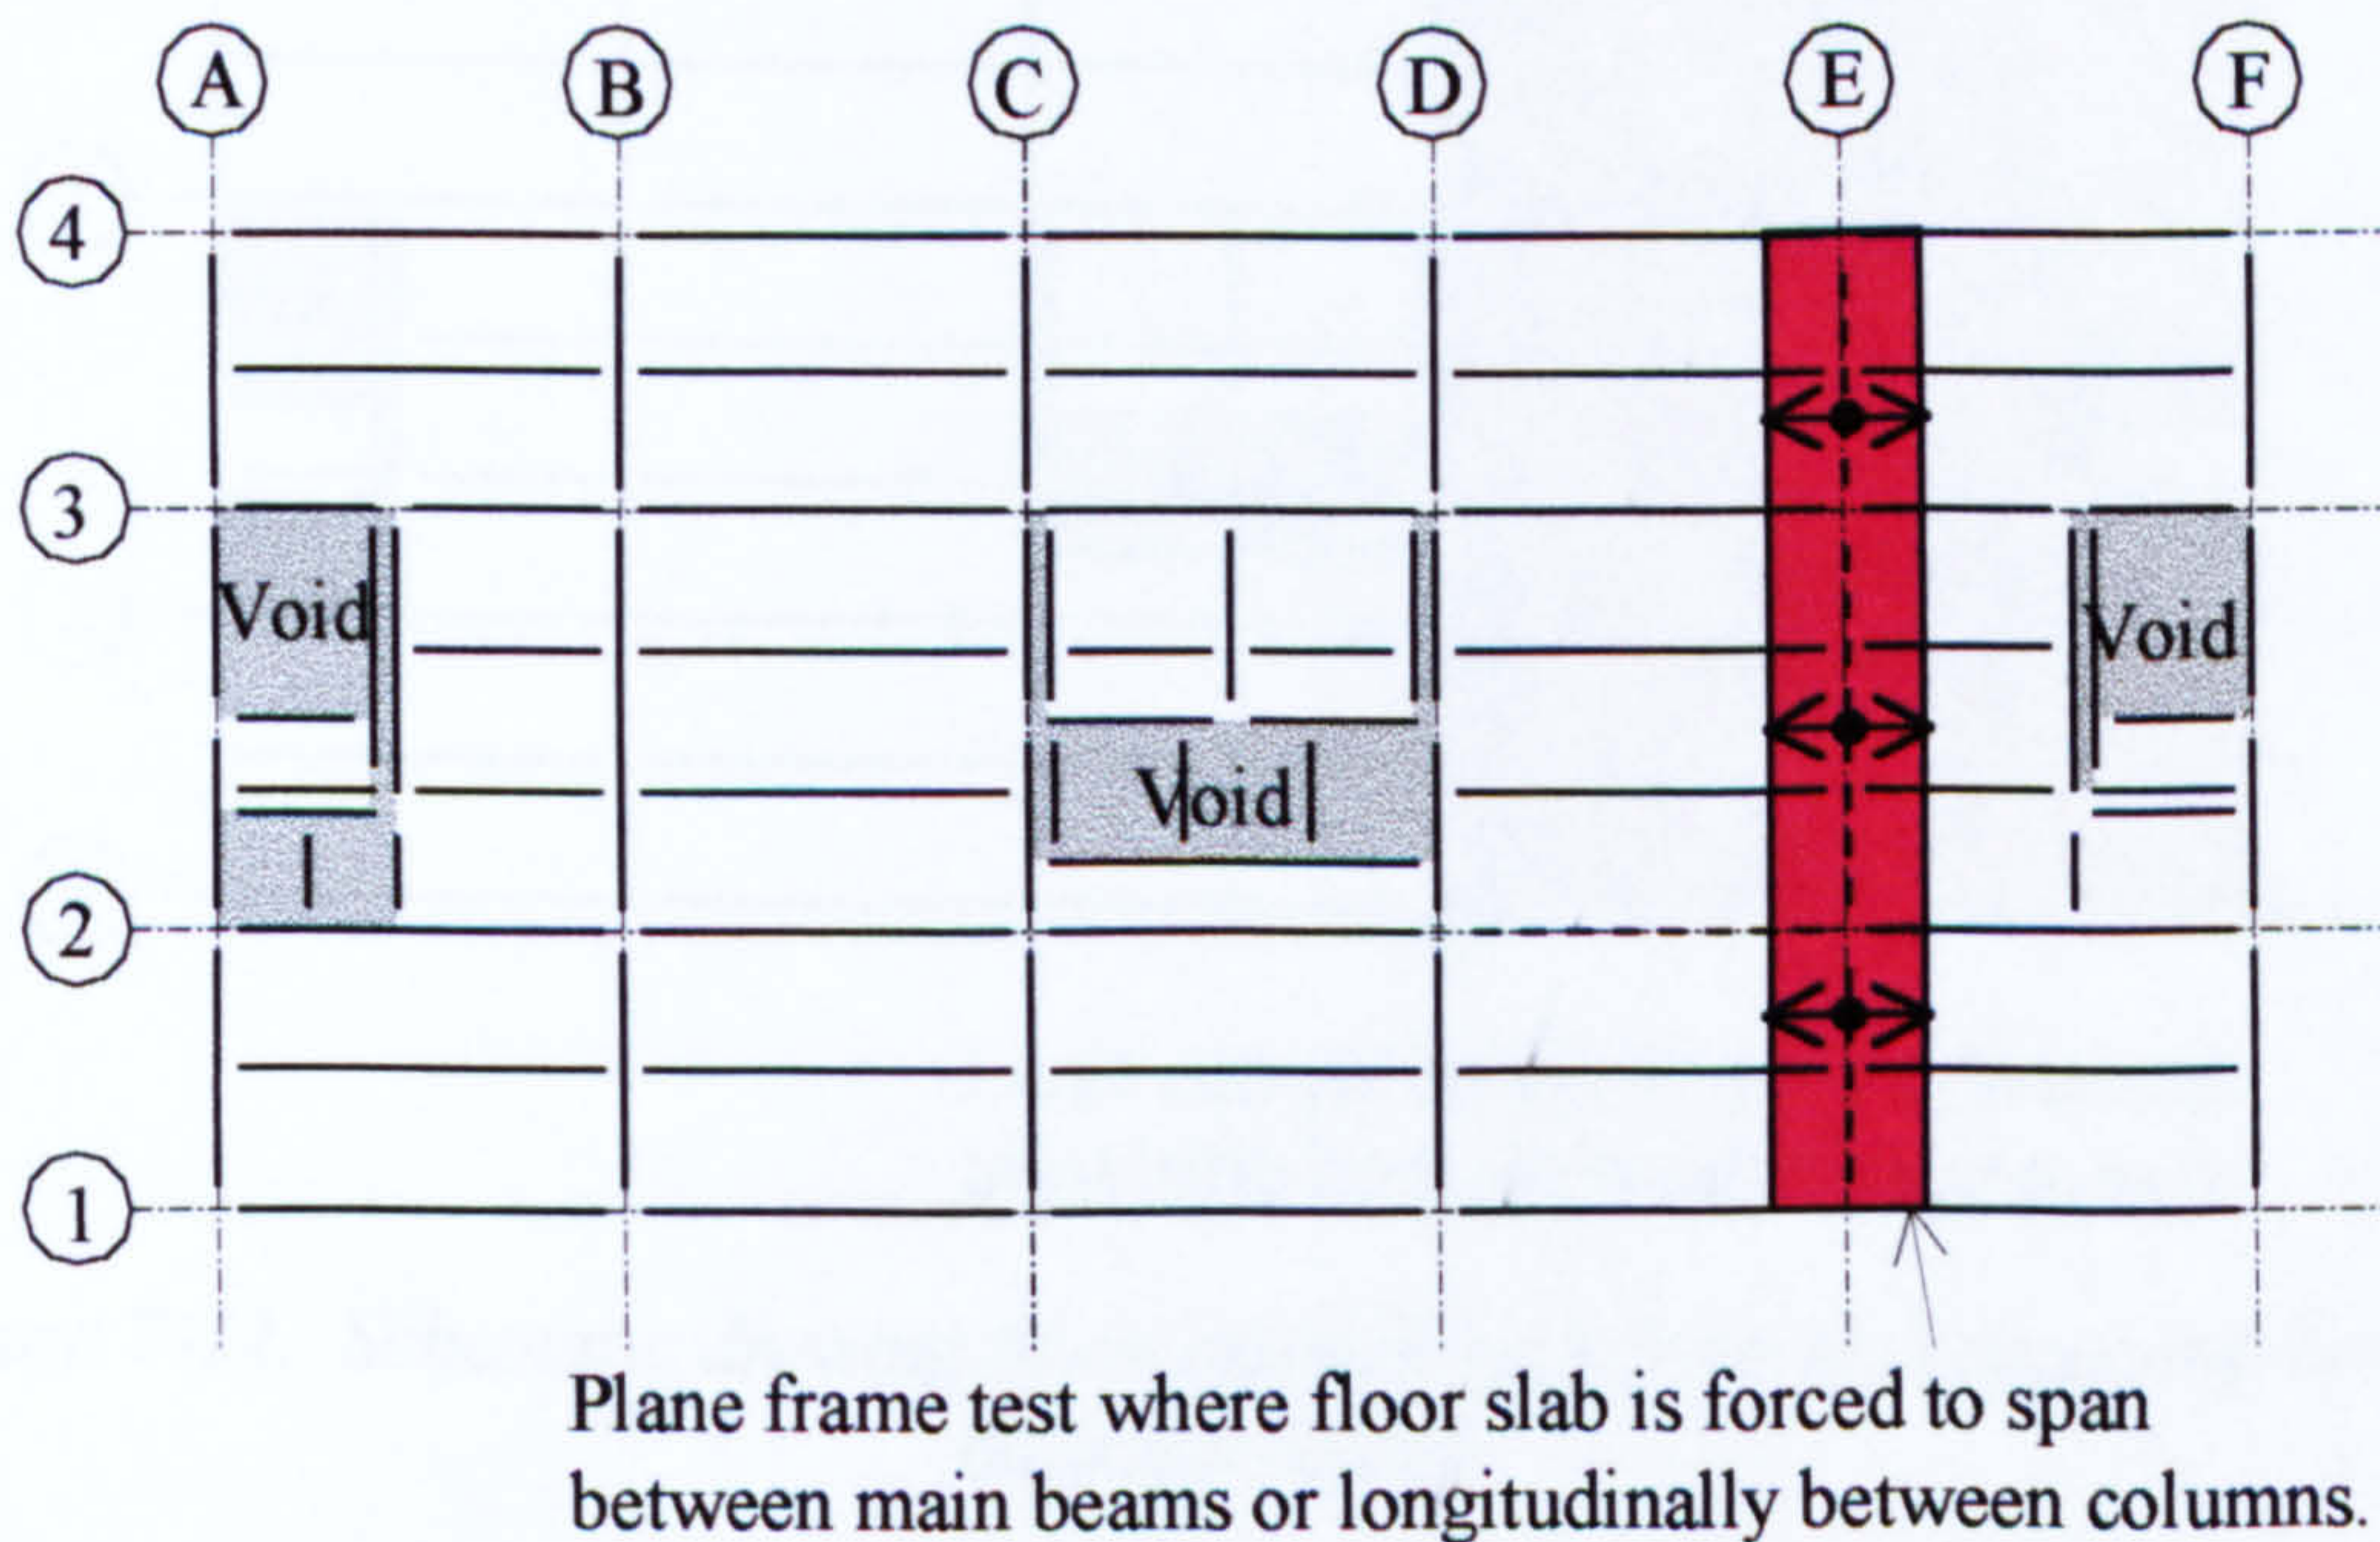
Schematic drawing of an example of a floor slab spanning between adjacent beams.
